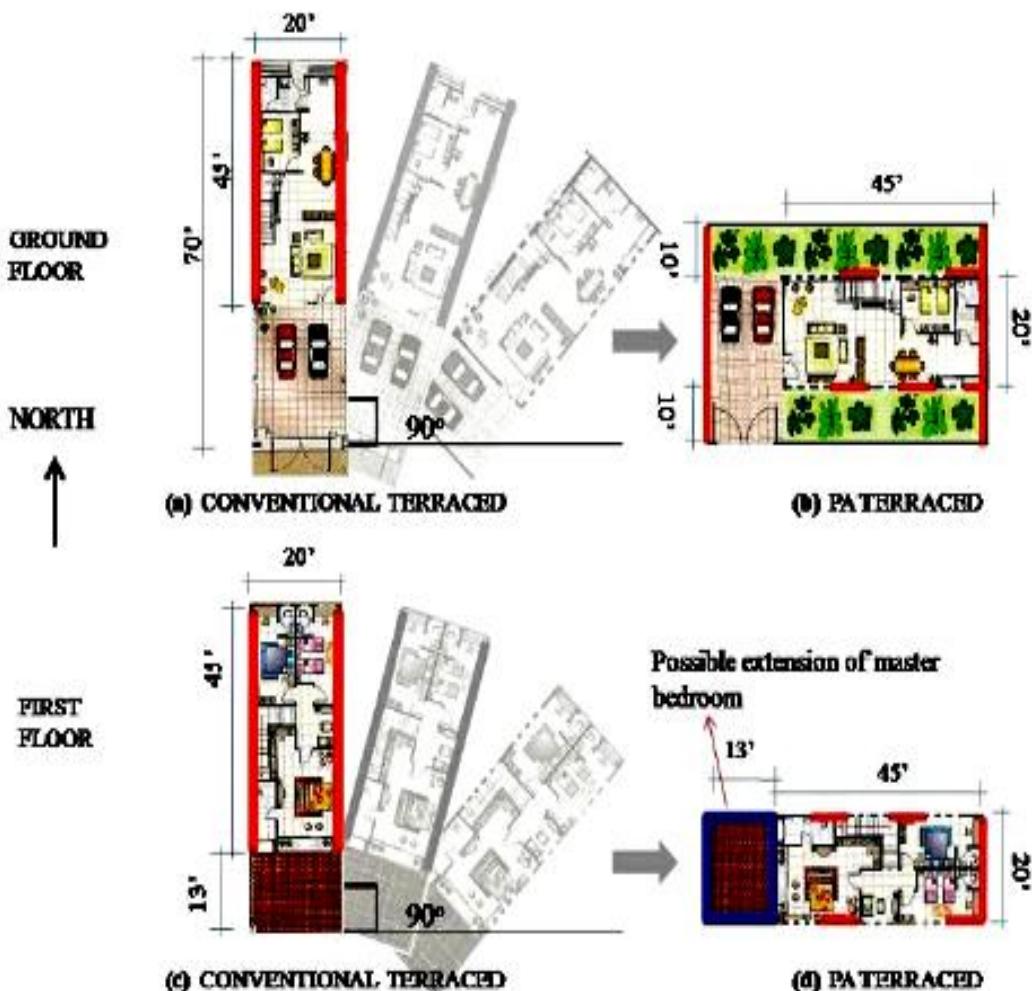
Floor Plans Transformation of a Conventional 2-storey Terraced House (a) & (c)
